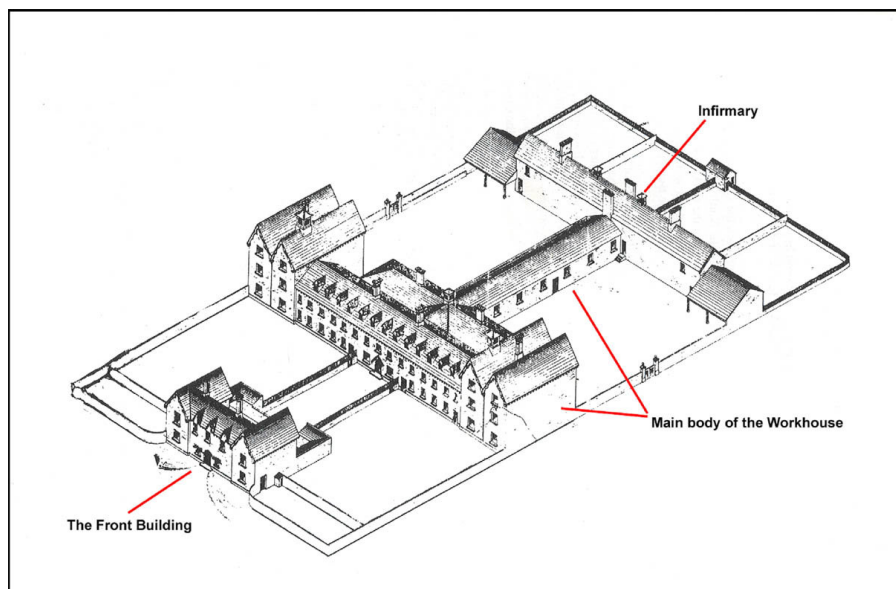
General layout of the Irish Workhouse (Johnston 1996, 8).
